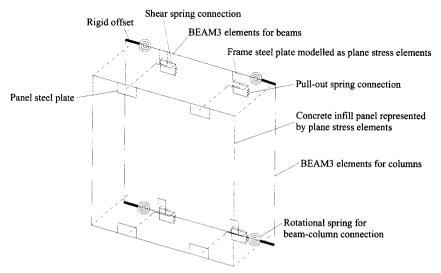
Finite element model set-up (off-set infill panel for improved clarity)
